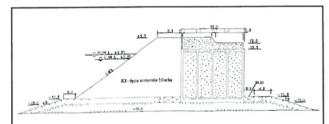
Cross-section, First Central Breakwater Hachinohe Port, Japan (Ligteringen 1996).
